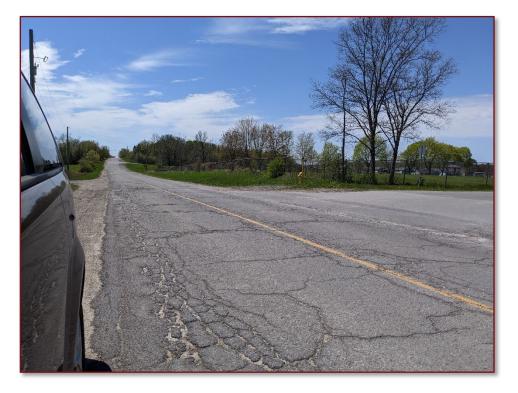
Ridge Road between Norways and Airport Roads – Drainage Ditch and Buried Utility
